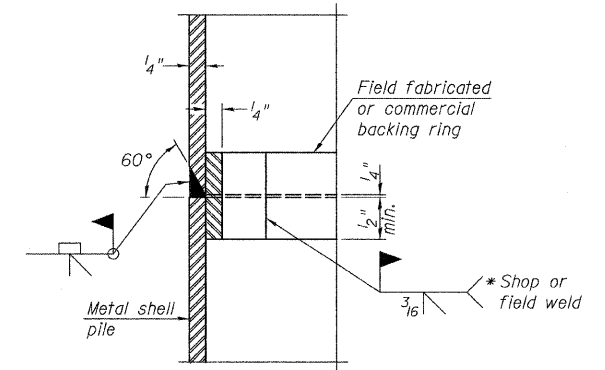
DETAIL OF CYLINDRICAL STEEL SHELL FOR CAST IN PLACE CONCRETE PILES
